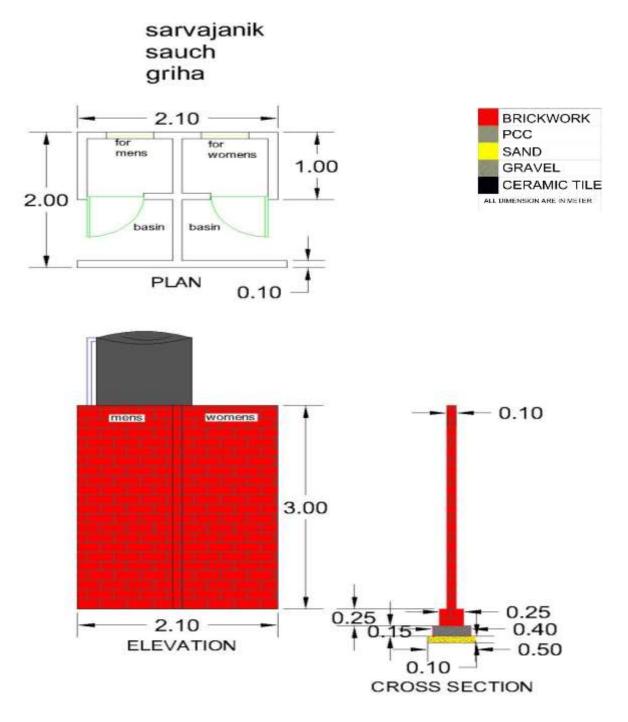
Plan, Elevation & Cross Section of Public Toilet
